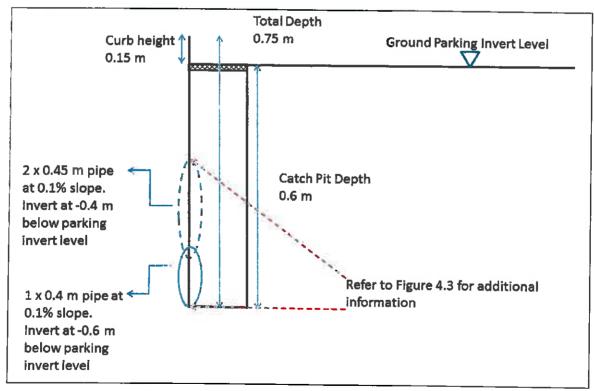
Conceptual Long Section Schematic of the Ground Level Catch Pit and the Stormwater Diversion Pipes.
